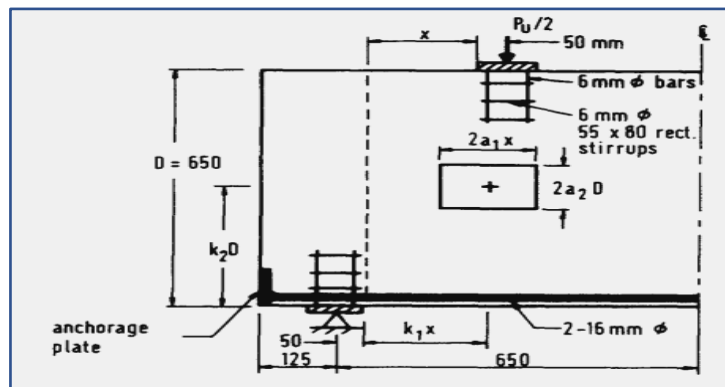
Geometrical dimensions and reinforcement details of the deep beams [15].
